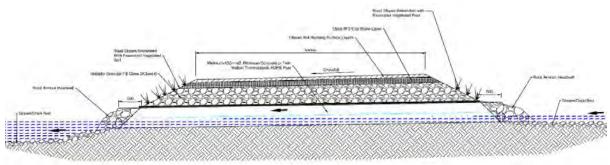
Typical Piped Culvert Crossing Long Section.
